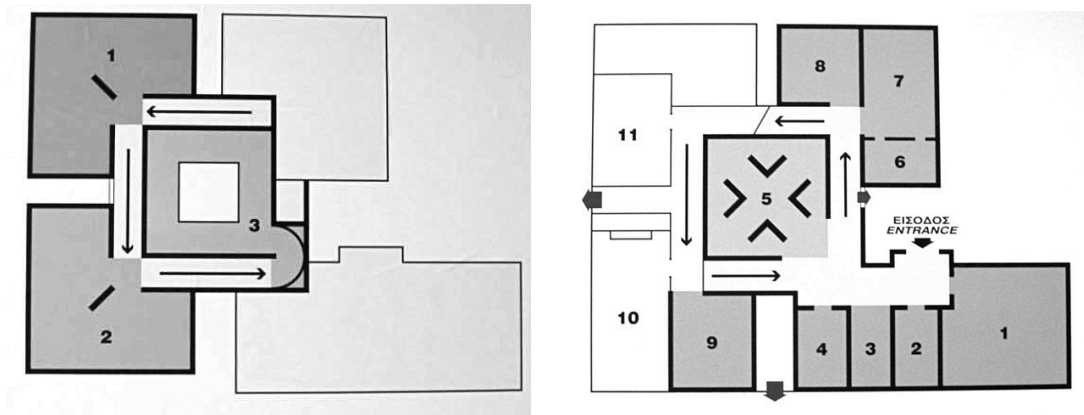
The plan of the Greek Museum of National Struggle as portrayed at the entrance. To the left: Ground floor plan and the First floor plan can be seen on the right (Photo: Author, 2011).
